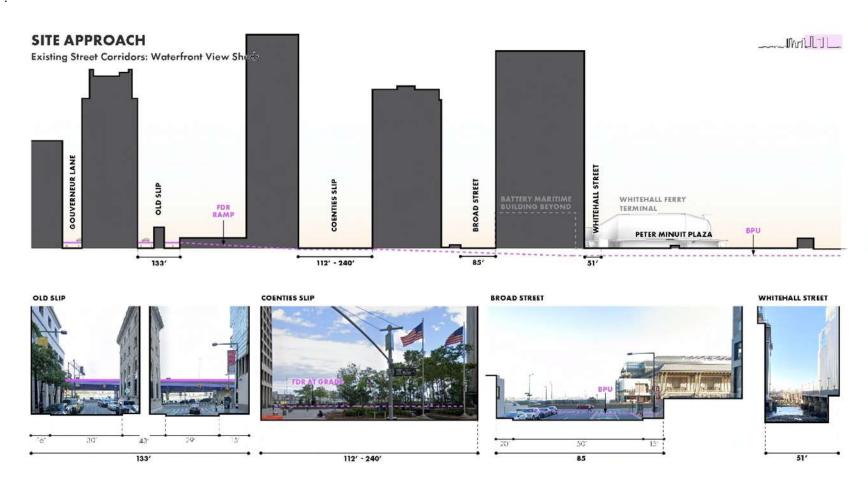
Existing Street Corridors - Waterfront View Sheds (Whitehall Street to Old Slip)
